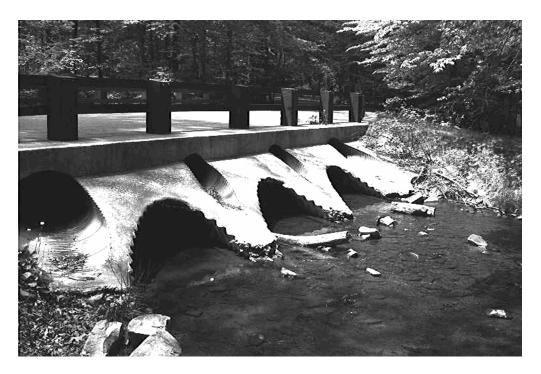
Metal arch culvert bridge leading to Owens Creek campground. Two previous metal arch bridges, the first built in the mid-1960s, with grouted rubble rather than concrete headwalls, have washed out. This version probably dates to 1990s (1999).
